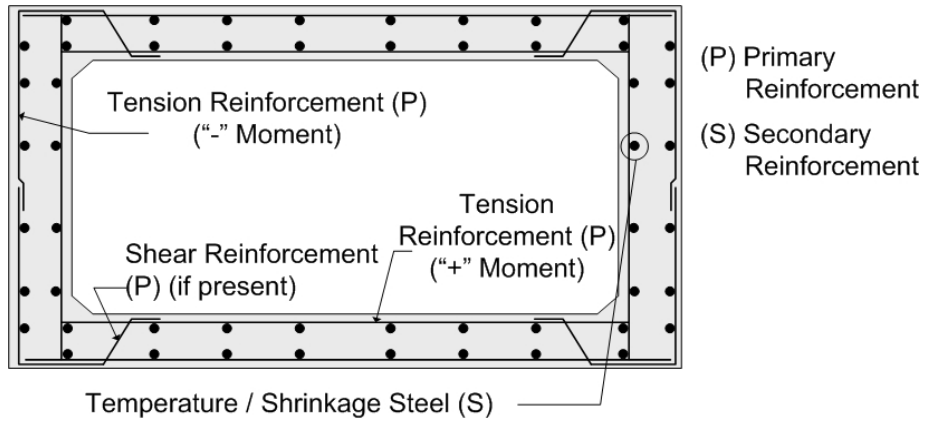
Steel Reinforcement in a Concrete Box Culvert
